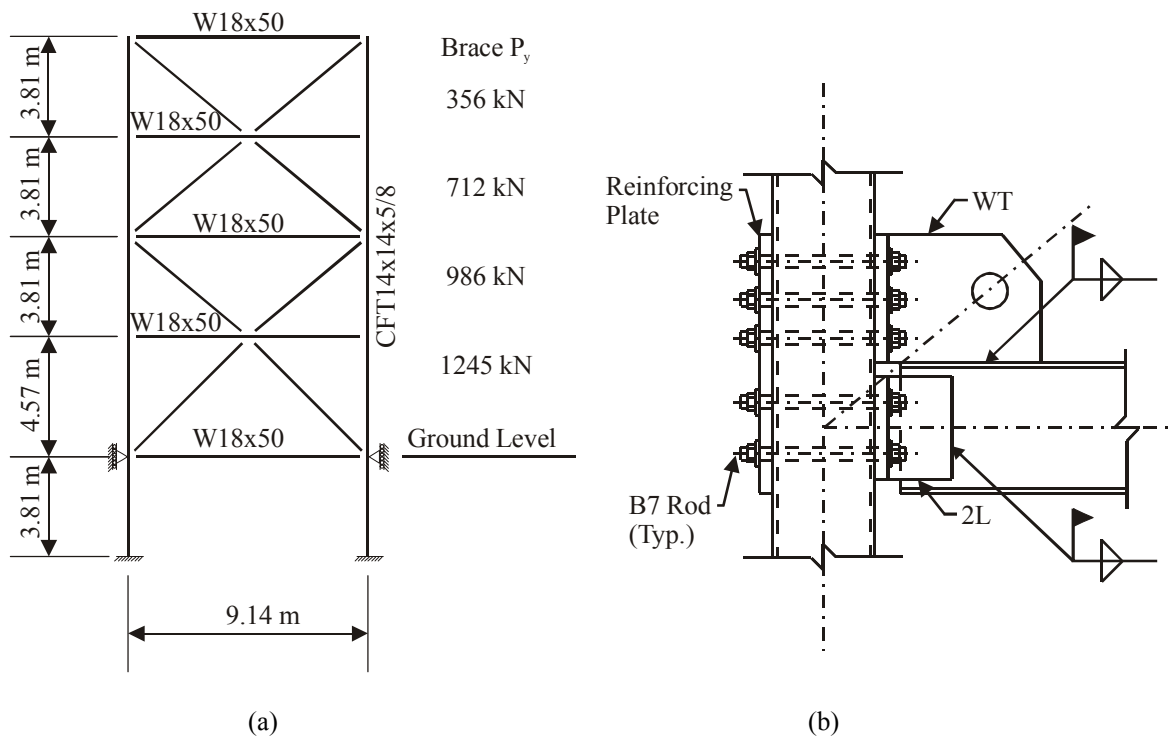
Prototype Frame: (a) Elevation; (b) Schematic Connection Detail
